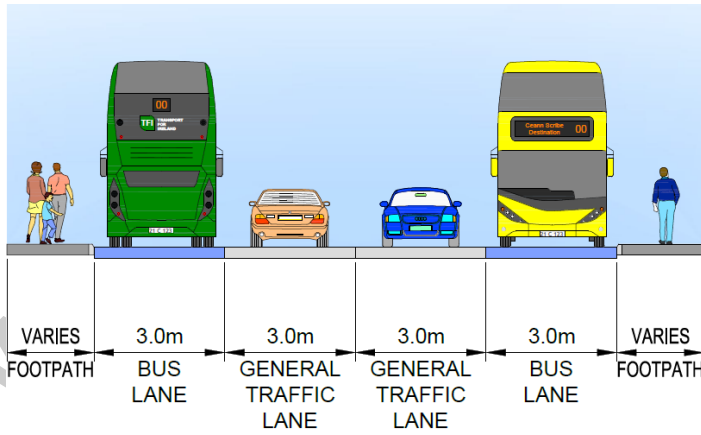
Section 1, Proposed Option 4 – Cross Section B-B
